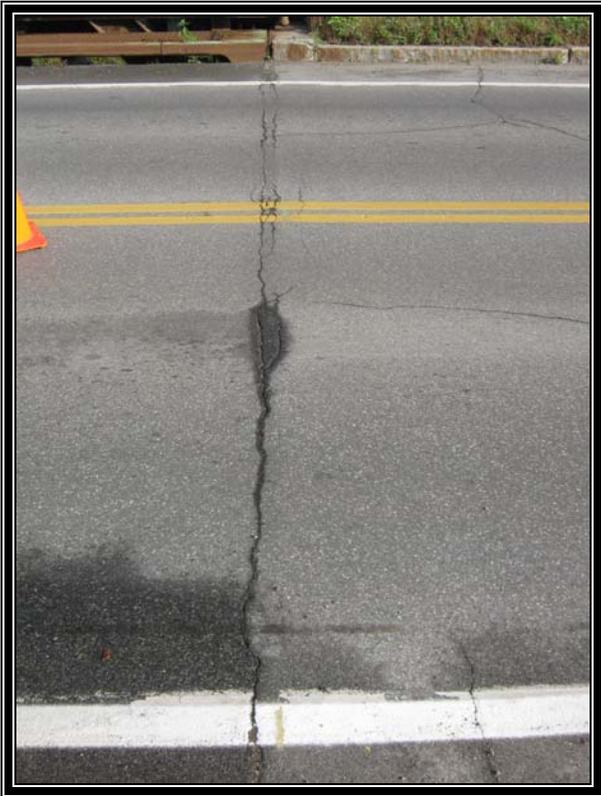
Wearing Surface Cracking at End of Deck (New Hampshire Abutment)
